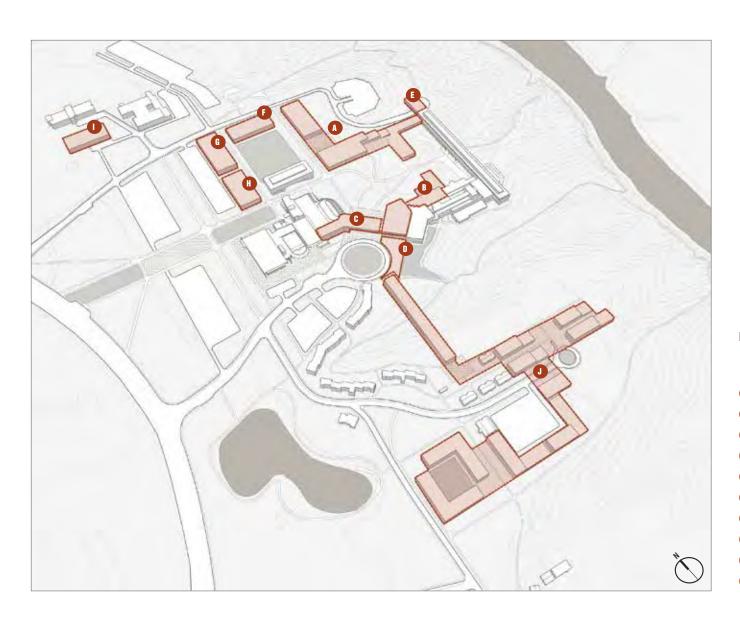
| DEMONSTRATION PLAN (PERSPECTIVE VIEW): GROSS FLOOR AREAS (GSM)
